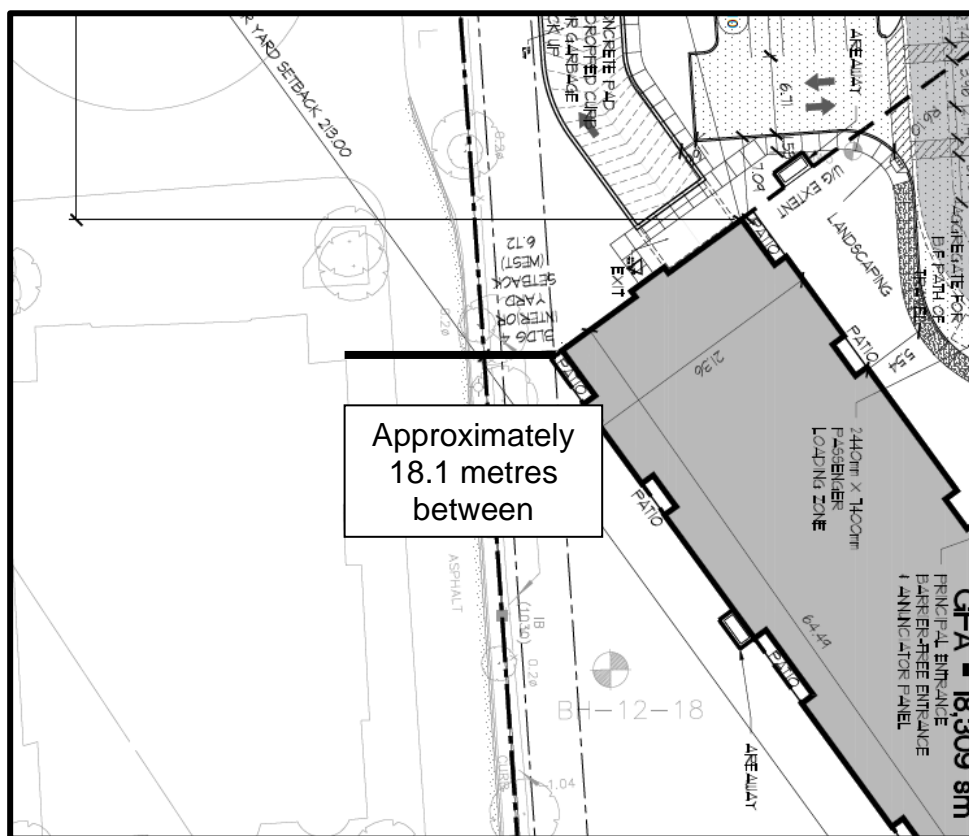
Approximate distance between existing building to the west and proposed building to the east
